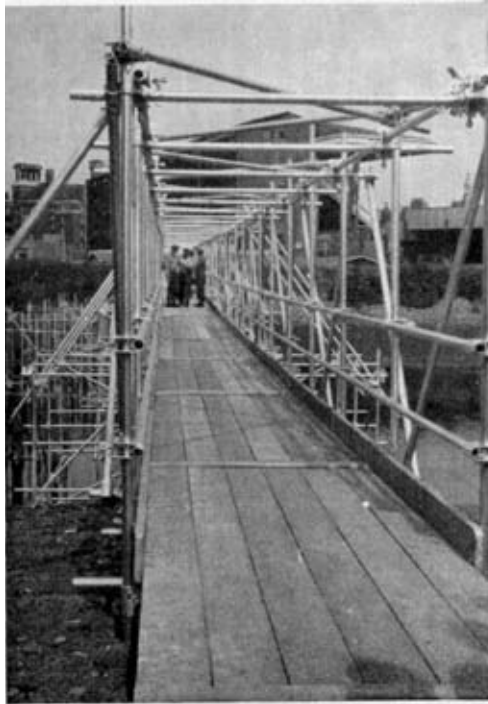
View from end of bridge, looking towards Cardiff Arms Park.
